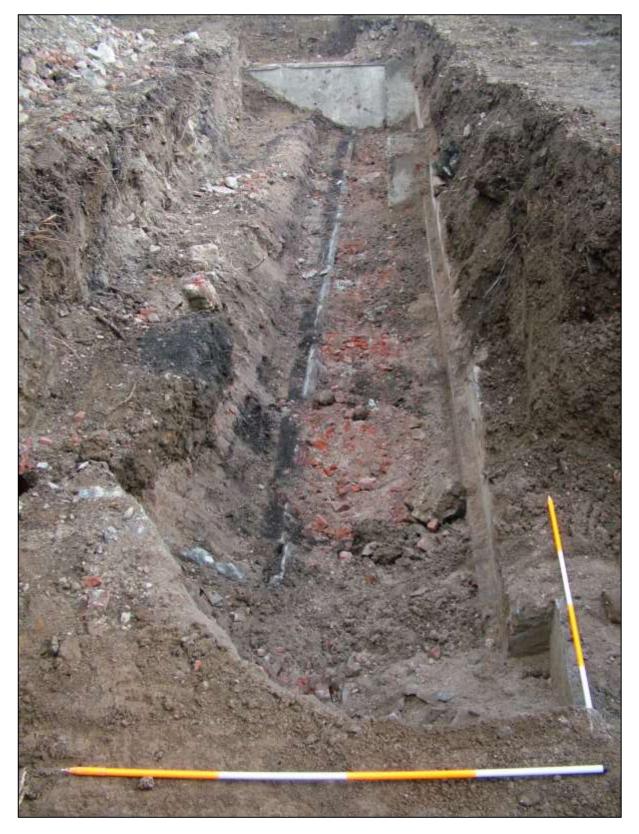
Area 3 – Excavation to reveal external wall face and drainage, Portrane House. Looking E
